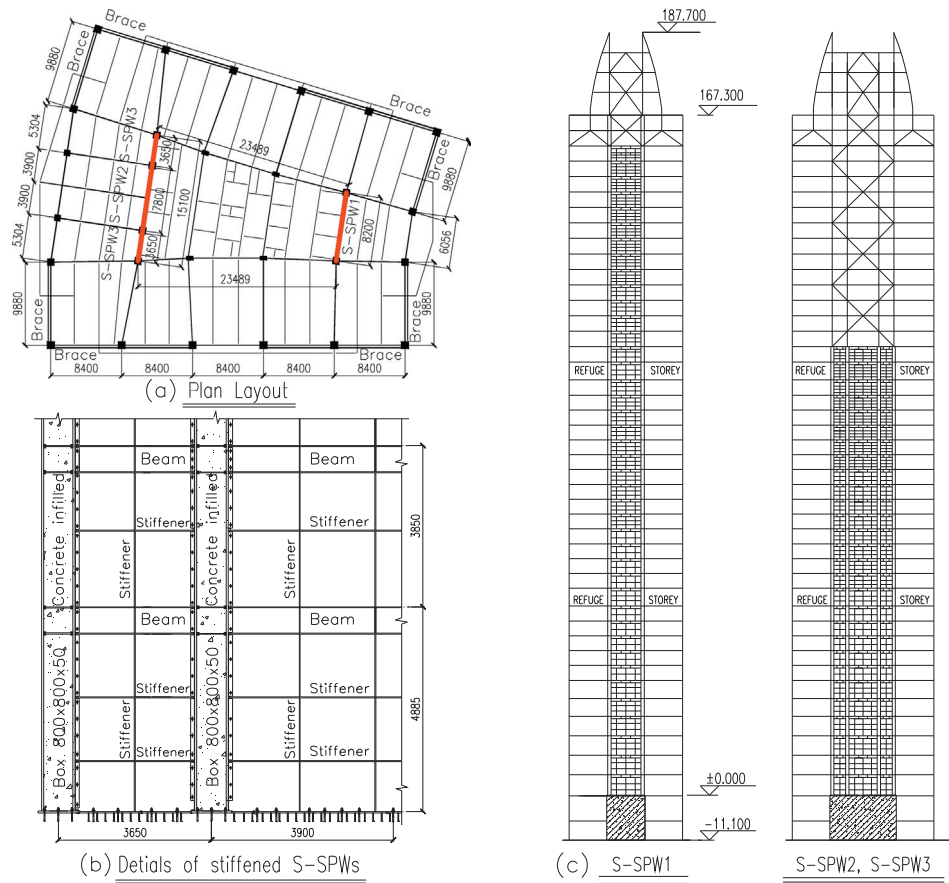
a) Building plan, b) details of the S-SPWs, c) elevation of the S-SPWs.
